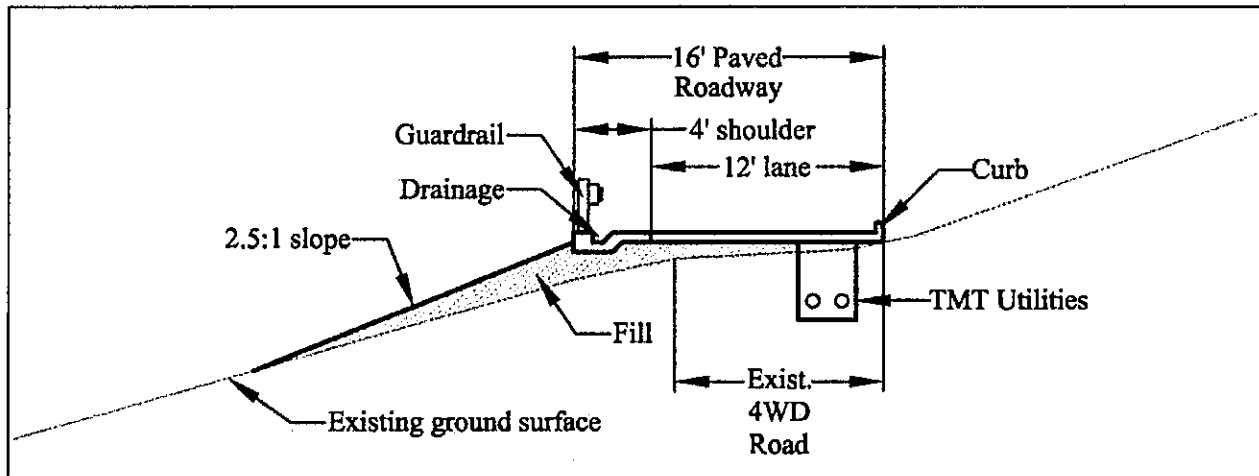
Cross Section of Access Way in Southernmost Cinder Section Overlapping 4-Wheel Drive Road
